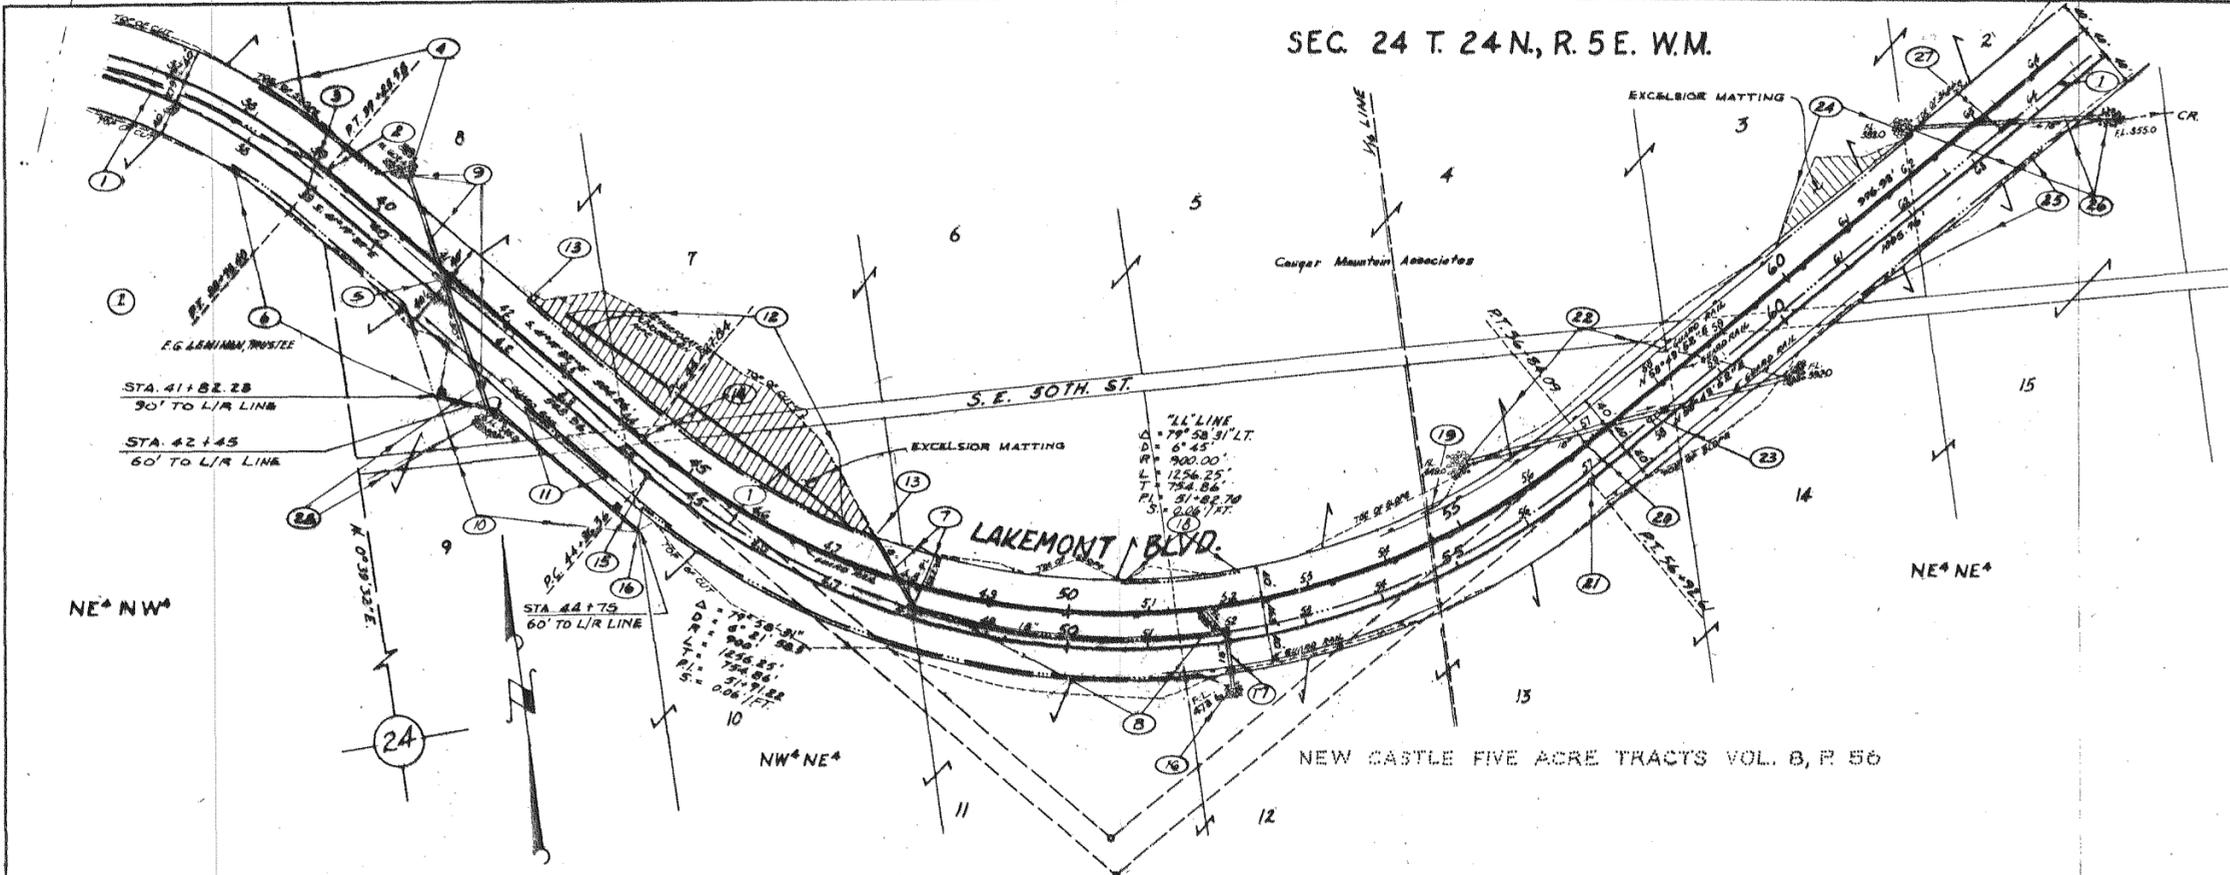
PLAN - PROFILE & P. R. STANDARD
